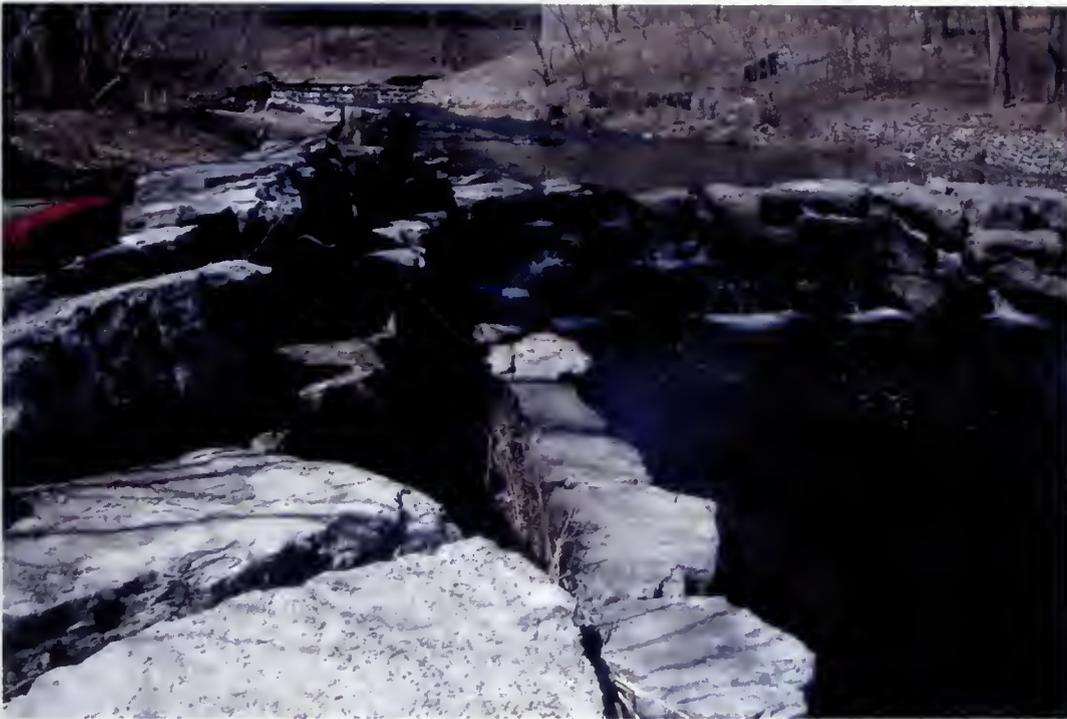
Stepped armourstone wall and stepped weir along Cooksville Creek near Mississauga Valley Boulevard, Mississauga, Ontario. Photo is looking upstream.
